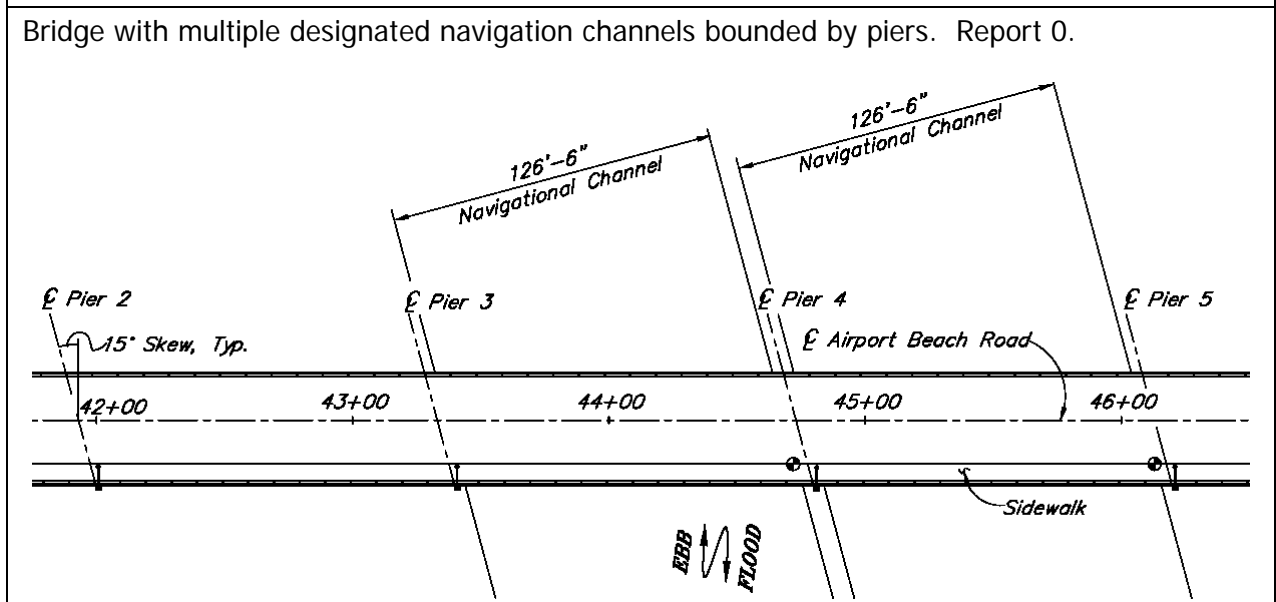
Bridge plan view indicating multiple navigation channel width dimensions to substructure units in the waterway. (Source: Alaska DOT)
